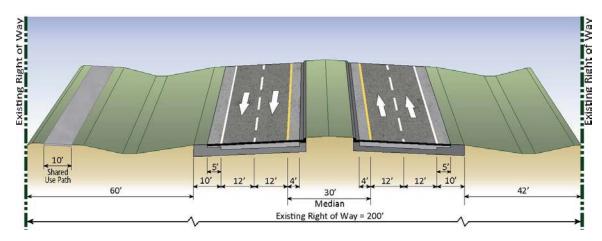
SR 29 Typical Section from the SR 29 Bypass Junction to Experimental Road
